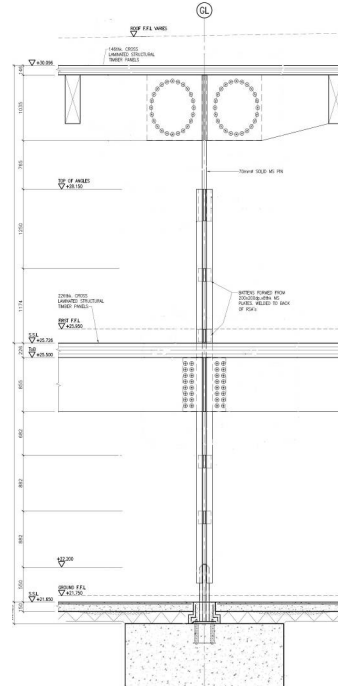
Column elevation showing glulam to column connections at roof (circular bolt arrangement) and first floor (rectangular bolt arrangement)(Image copyright: Buro Happold)
